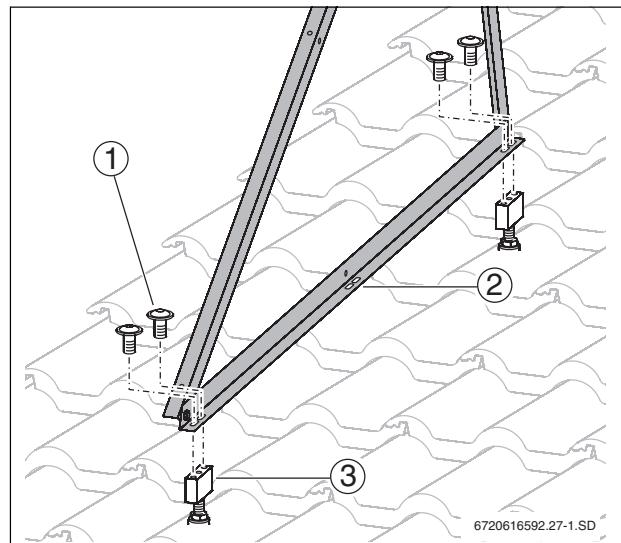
Roof connection with headless screws (here: on a roof with tiles)
